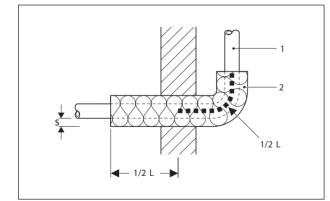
Fire protection Geberit Mepla Ø 16 - 75mm: Wall penetration, solid wall, bend
